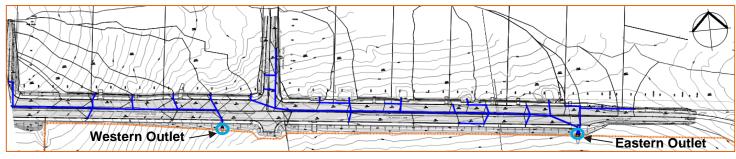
Proposed Crowson Lane Stormwater Drainage Upgrade (Source: Logan City Council, August 2022)
